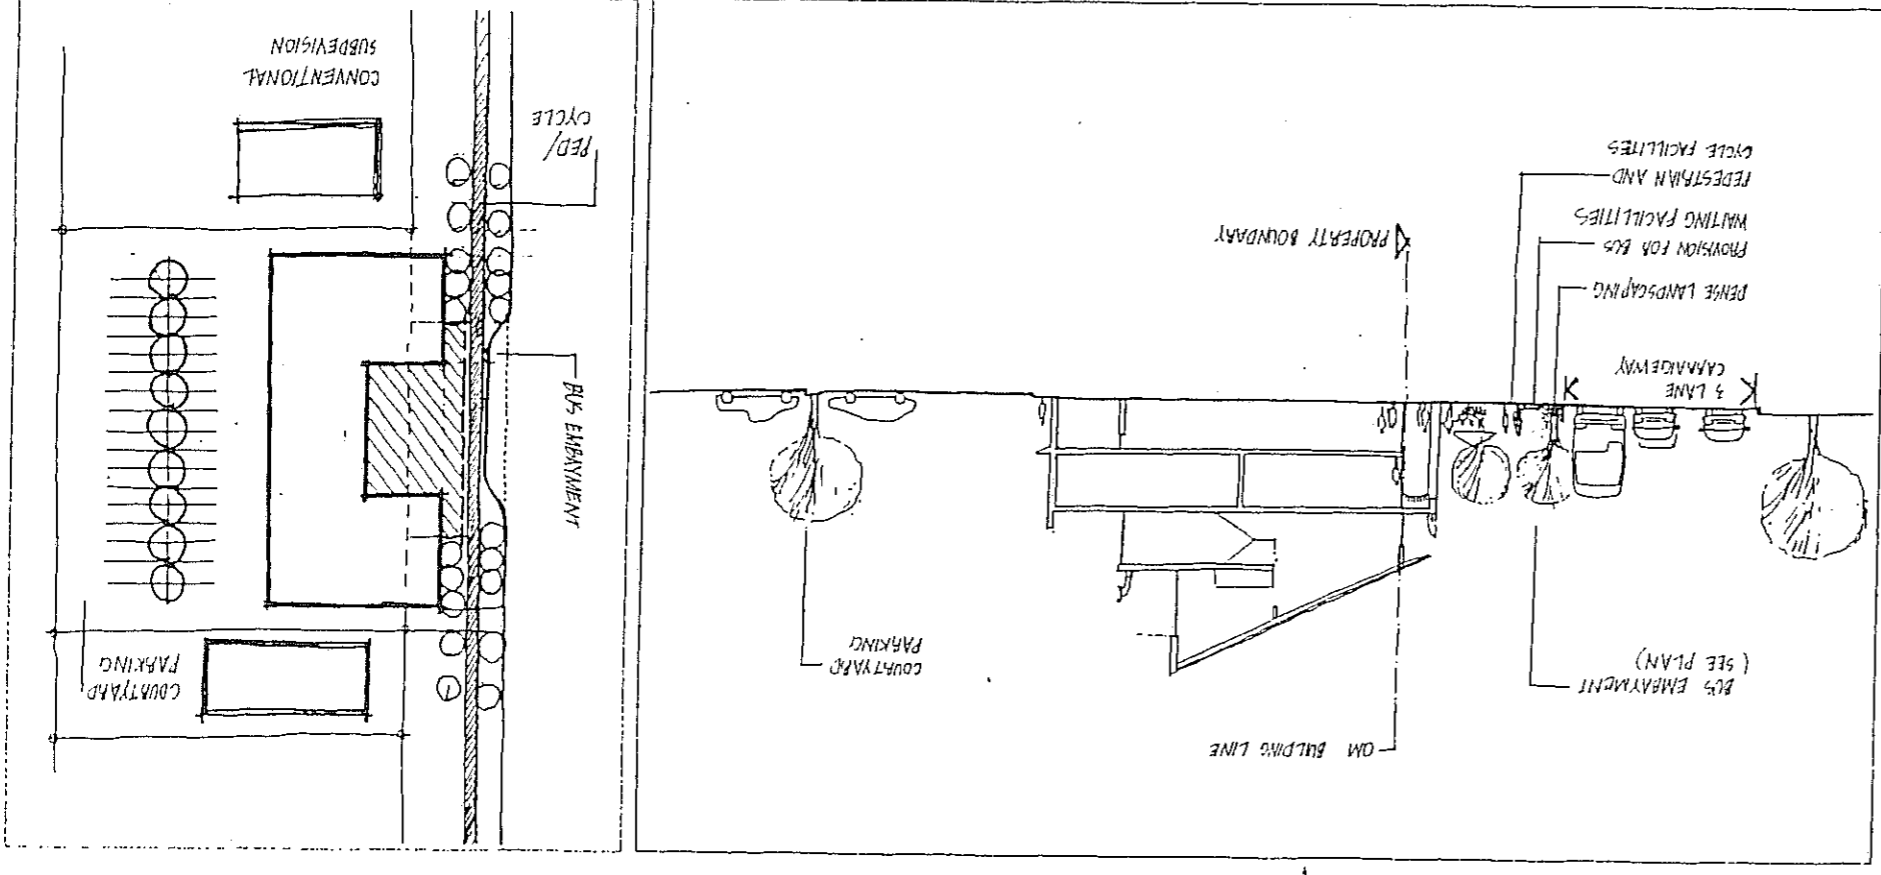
Full Cross Section of Mixed Use Activity Edge
